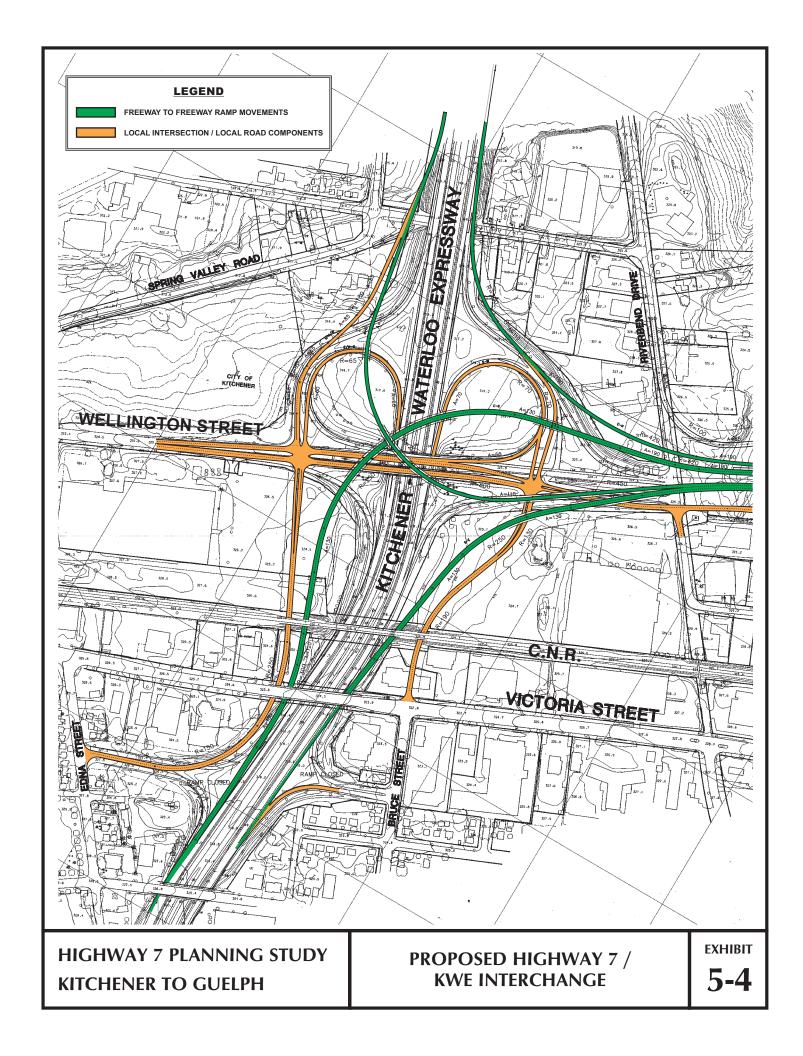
shows the proposed KWE / Wellington Street interchange. The existing Wellington Street interchange must be modified in order to provide access to and from New Highway 7. This interchange must also provide access to the local network. As discussed in Section 4.2.2., the interchange was modified so there would be no direct access from Highway 7 to Wellington Street within the City of Kitchener. The interchange concept is shown schematically on Exhibit 5- 4.
